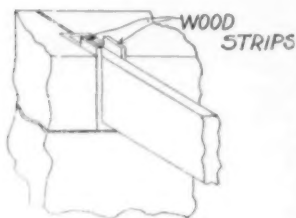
Goetz-Mitchell Beam-block: Beam in Wall.
